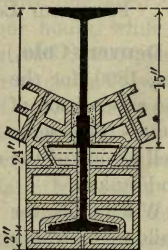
Single I-Beam Girder supporting Segmental Arches.
